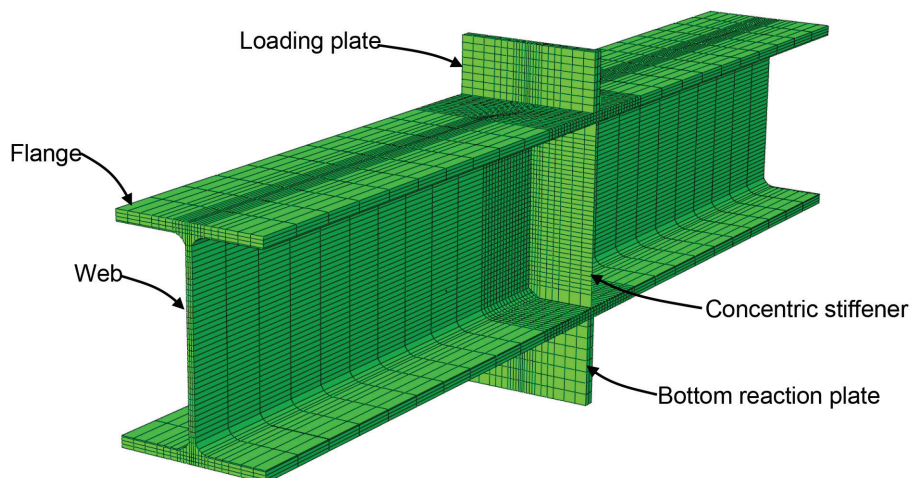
Isometric view of finite element model of W14x68 double compression specimen.
